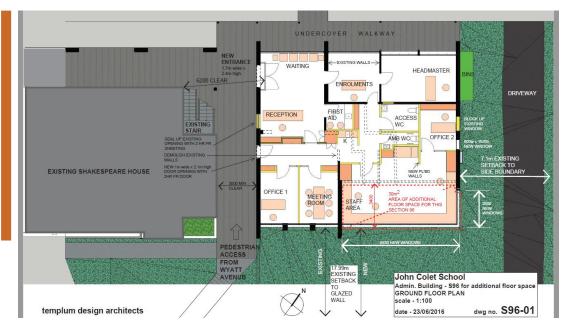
Proposed Ground Floor Plan, new extension outlined in red dotted line (Source: Templum)
